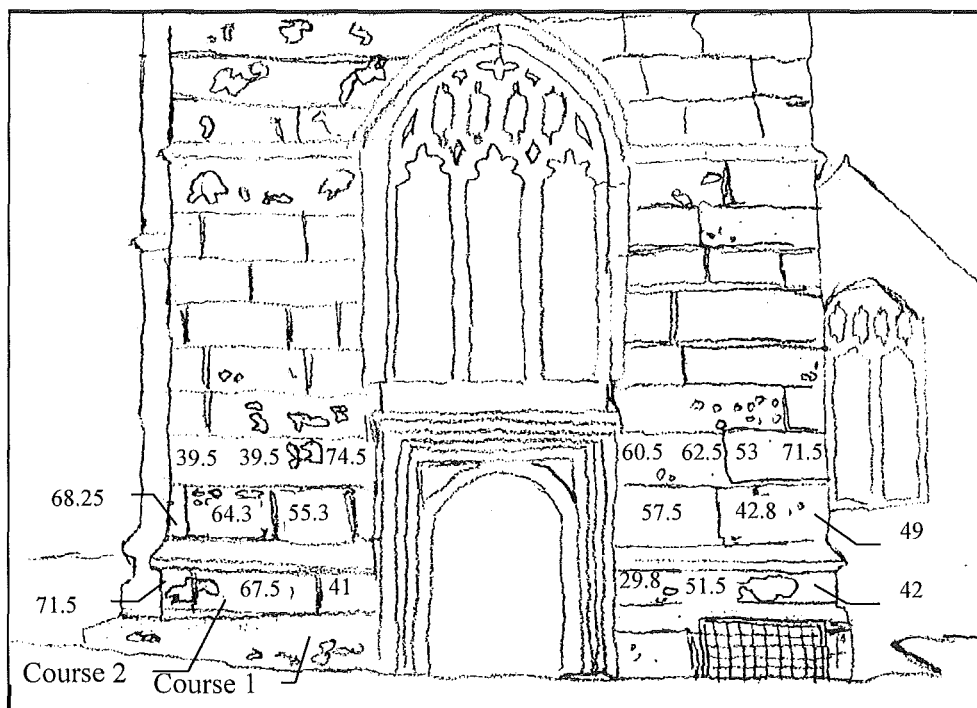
Sketch plan of Sheepstor Church, west facing wall.
